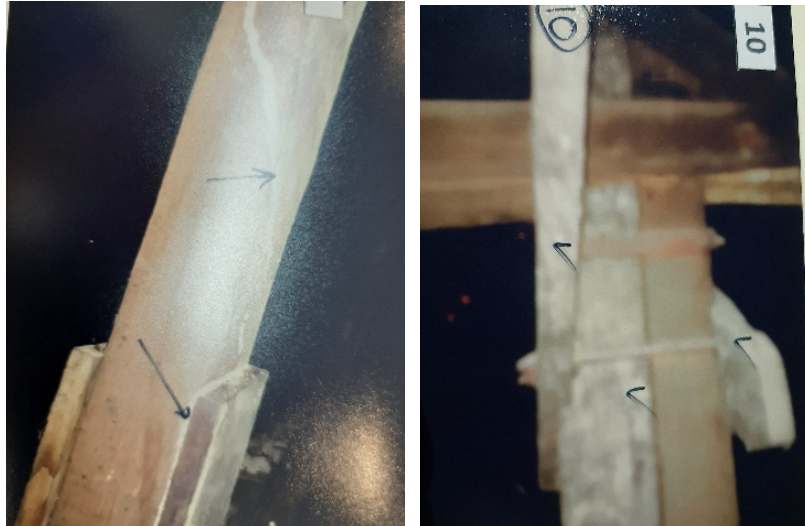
Condition of roof truss of the Jakarta Sion Church
